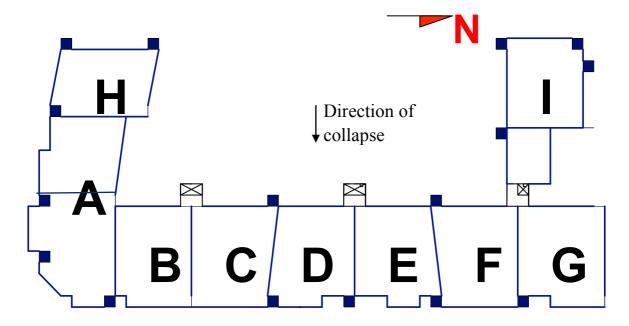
Floor plan layout of Weiguan Jinlong Building in Yongkang District (provided by Dr. Jui-Liang Lin)
